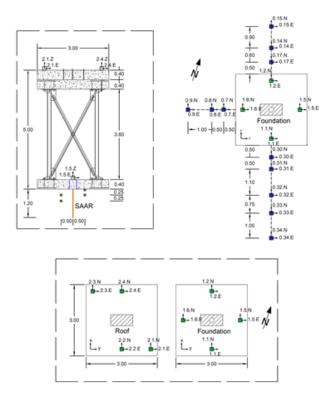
Instrumentation layout of the EuroProteas structure and the foundation soil.
